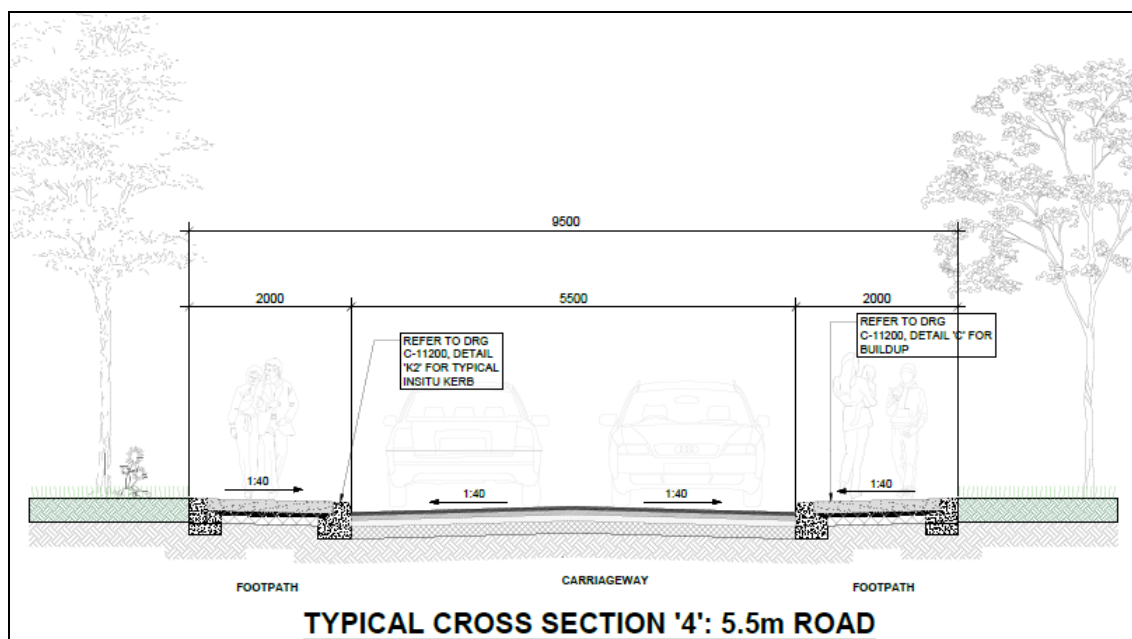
Proposed Cross Section 4 – 5.5m Road (Source: BMCE)
